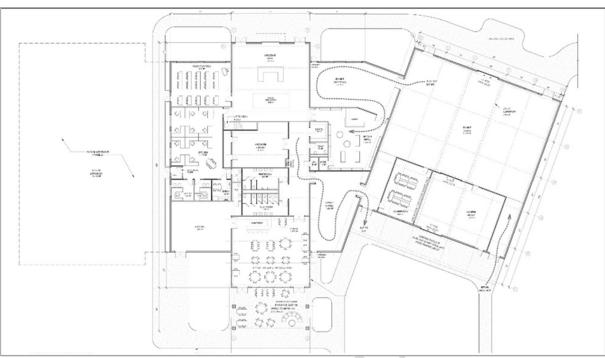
Proposed Cultural and Museum Building First Floor Plan
